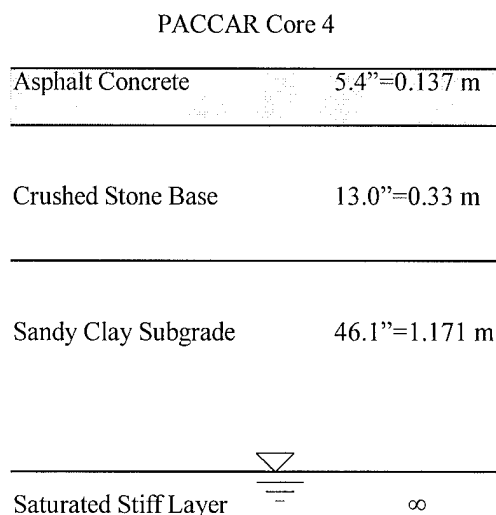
Pavement structures for PACCAR test site Core 4.
